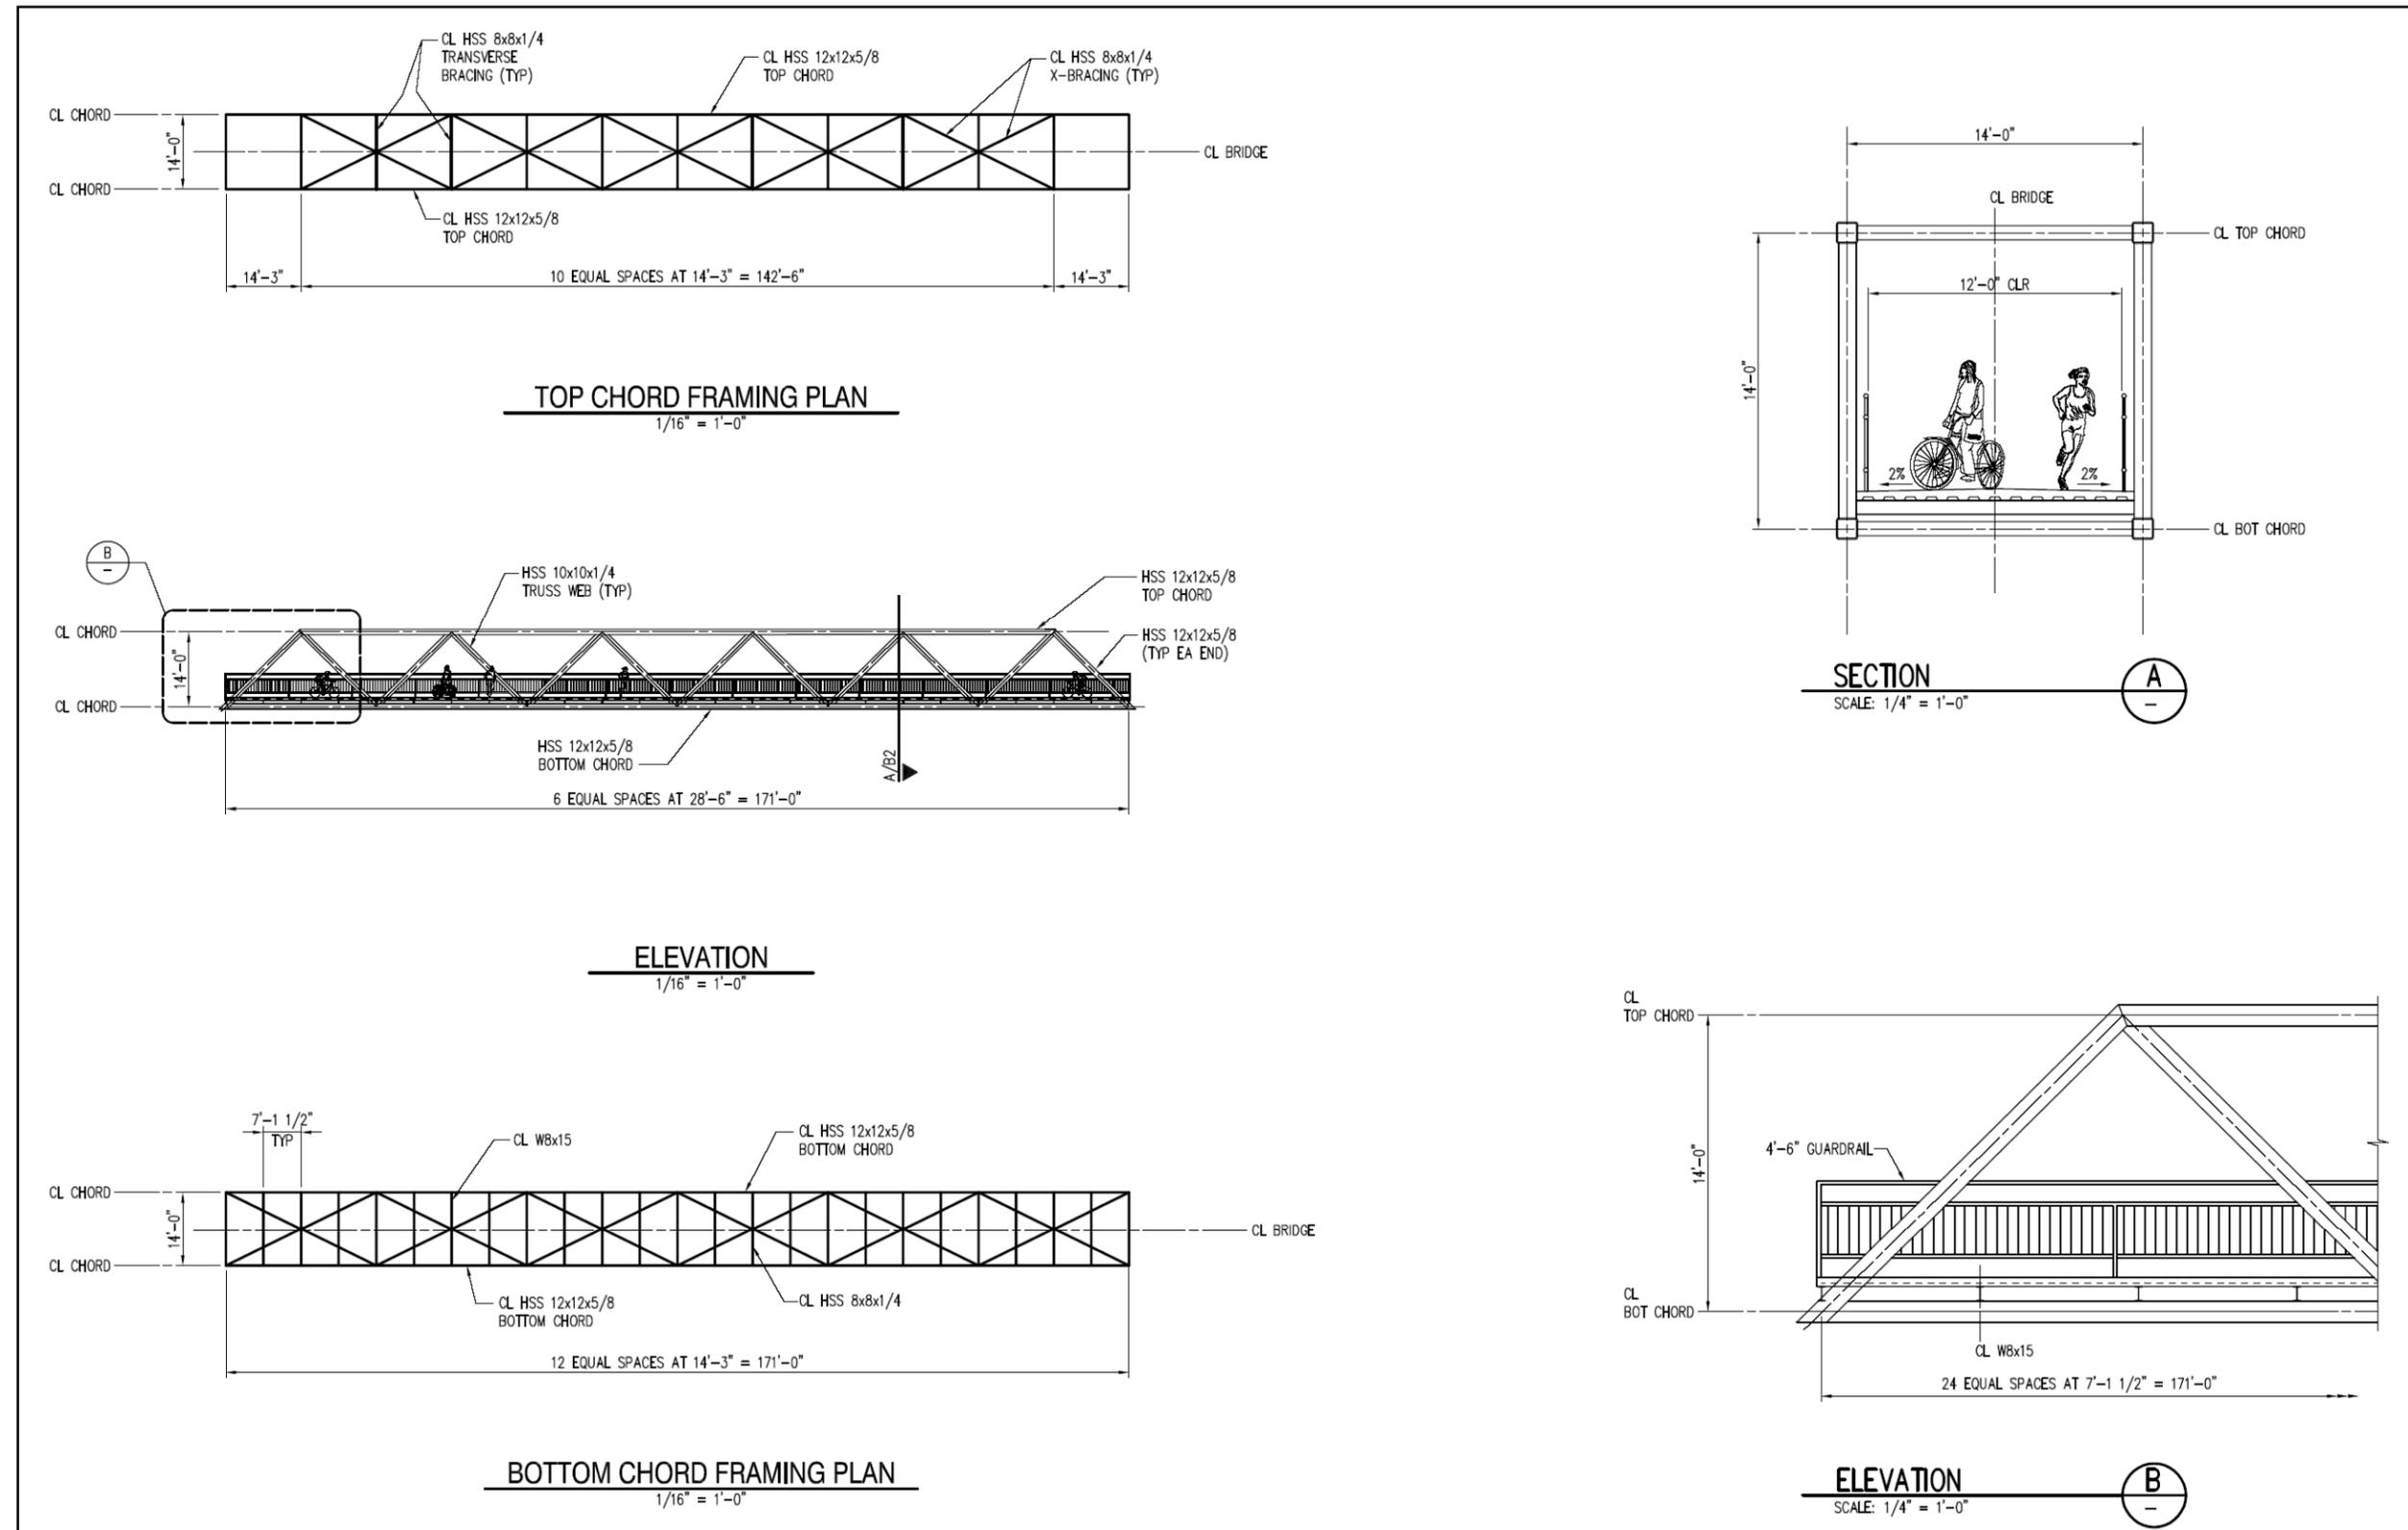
A: Alignment 1, Prefabricated Parallel Truss
